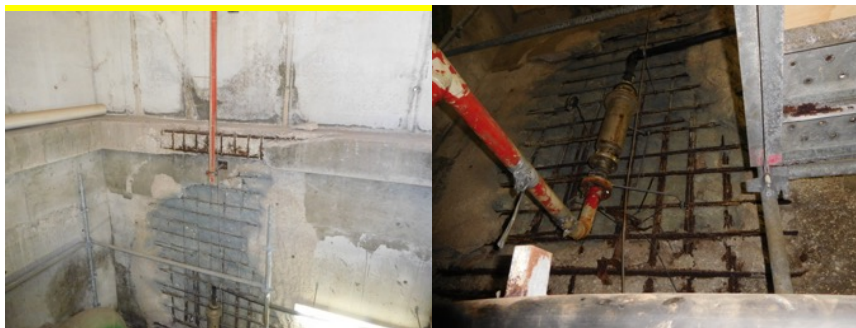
Concrete spalling and Steel Reinforcement Exposed on Internal Side Wall
